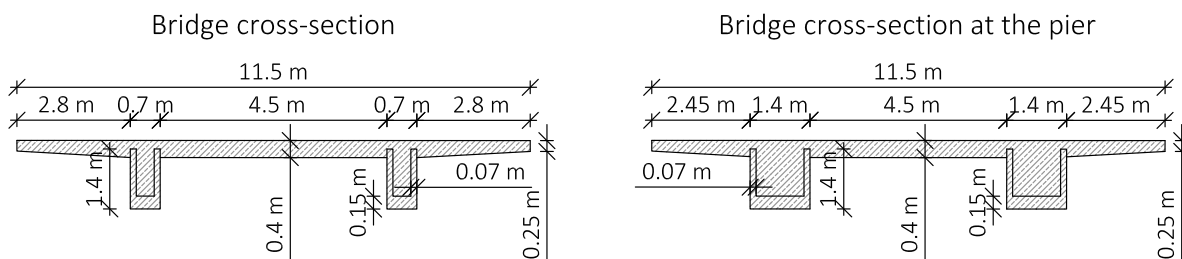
Selected cross-sections used for the redesign of the existing L21 Overpass
